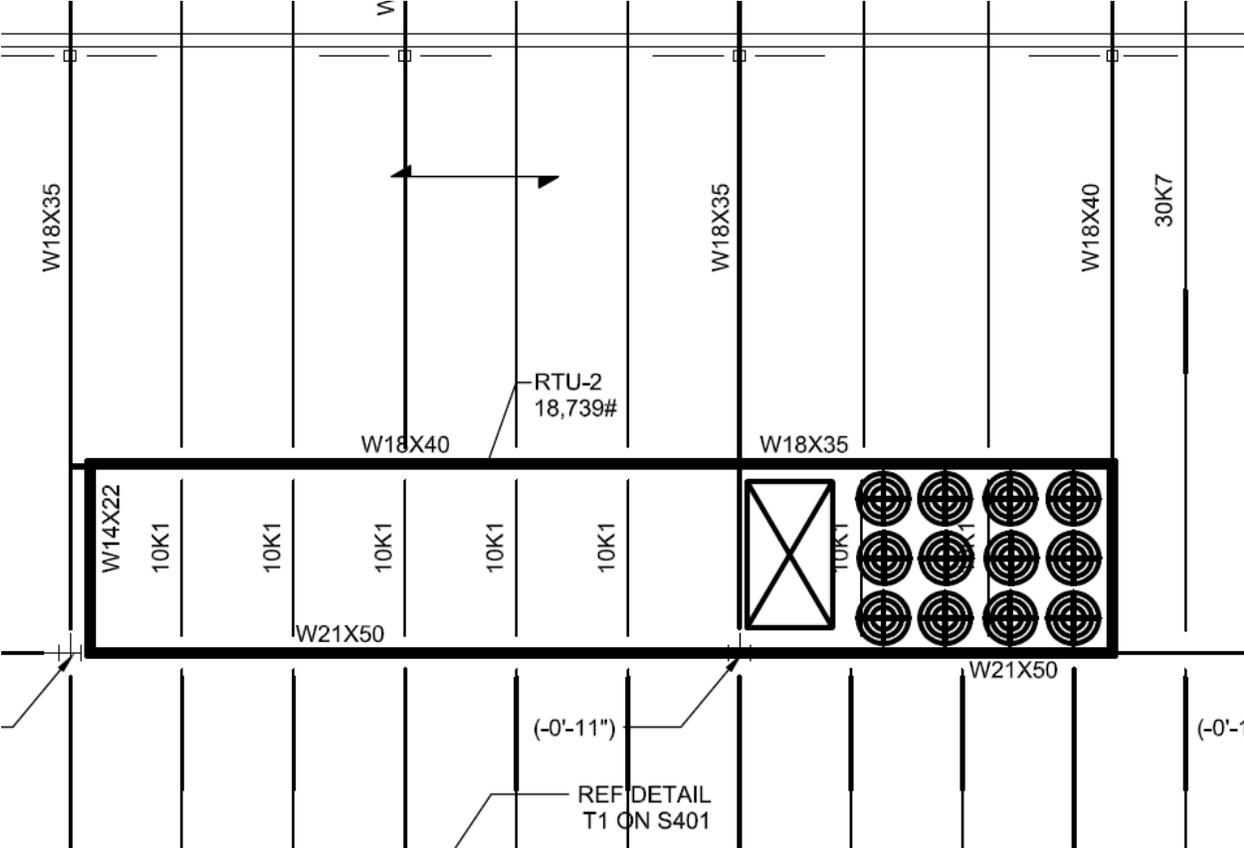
Joist Calculation for Column Lines 2-4 (typical)
